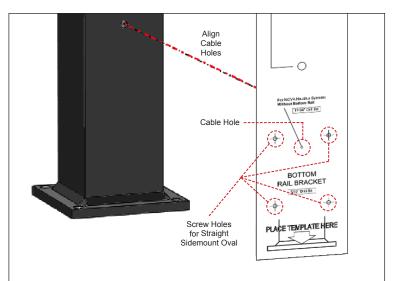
Figure B. Align the NOVA Nautilus drilling template against post and use a 5/32" drill bit to pre-drill your screw holes for straight sidemount oval. Pre-drill last cable hole using a 17/64" drill bit on post if installing top rail only.
